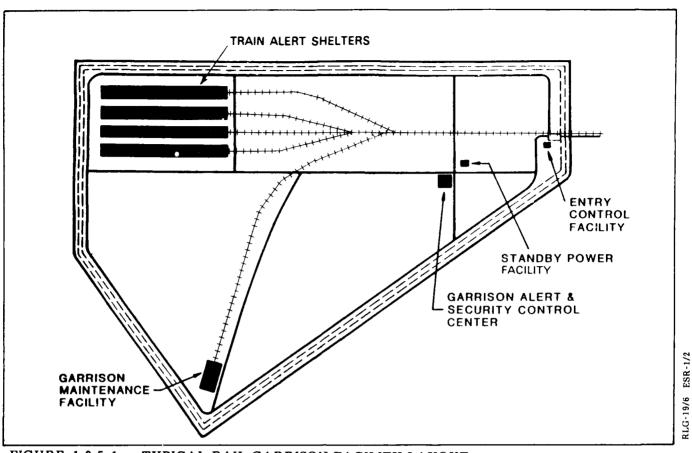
TYPICAL RAIL GARRISON FACILITY LAYOUT
